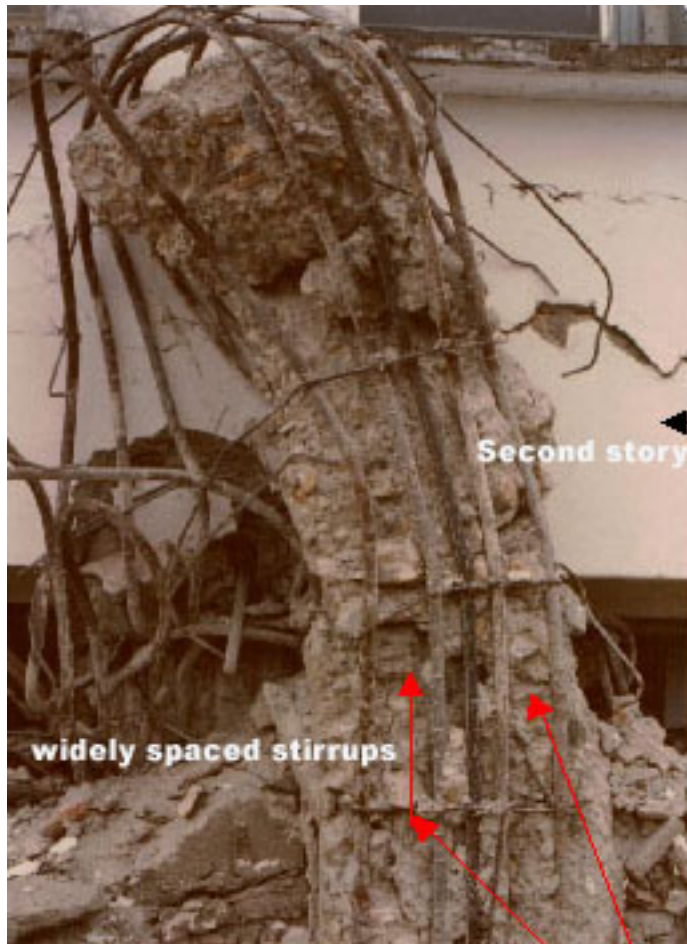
E: Collapsed building; Detail A shows too widely spaced stirrups
